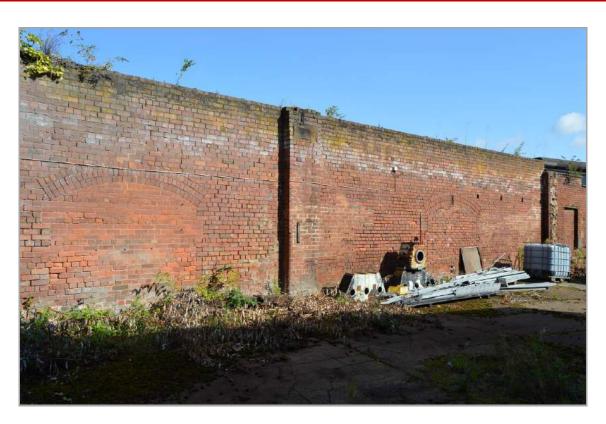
South side of Structure 6 (facing north east). Scale 2m.
